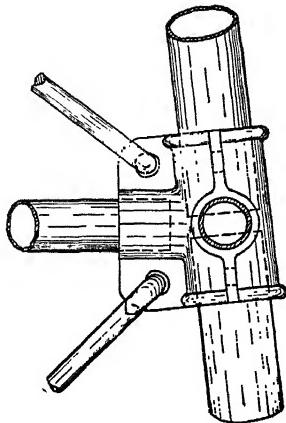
ZAHNISER AND STEN PIPE-DERRICK JOINT.
